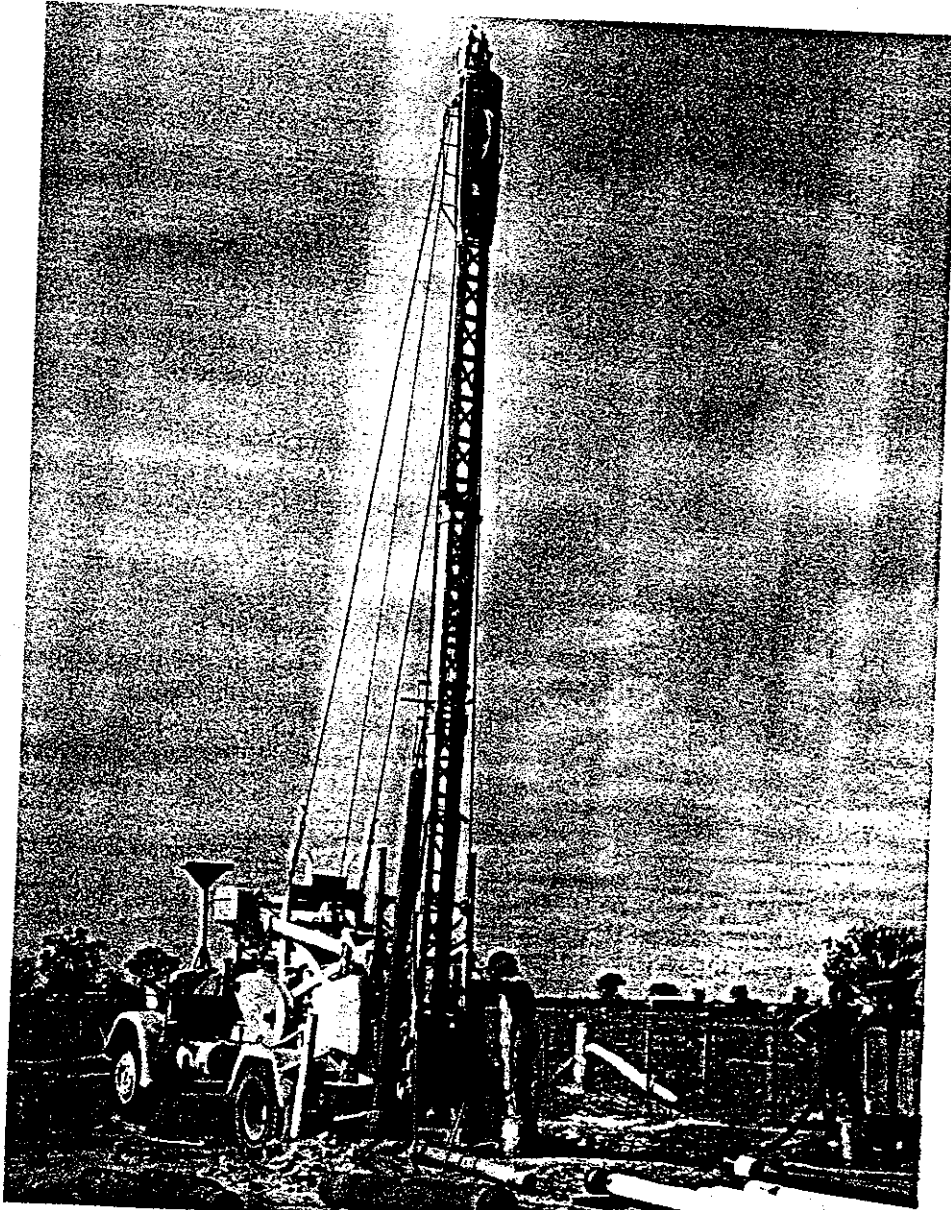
This small cable tool rig operating in Australia is equipped with a bailer to remove cuttings periodically from the borehole. Cable tool machines also are called percussion or "spudder" rigs.
